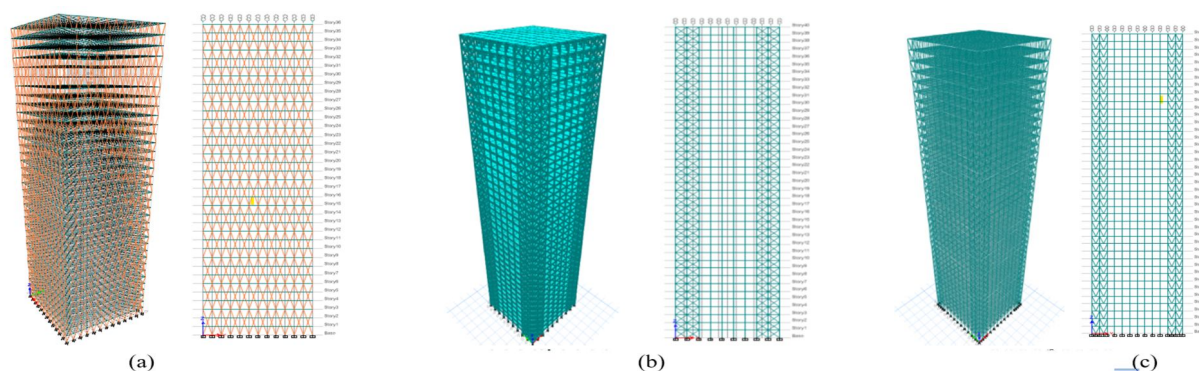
Isometric and elevation view of: (a) Diagrid Structure, (b) X-Bracing Structures and (c) Y-Bracing Structures
